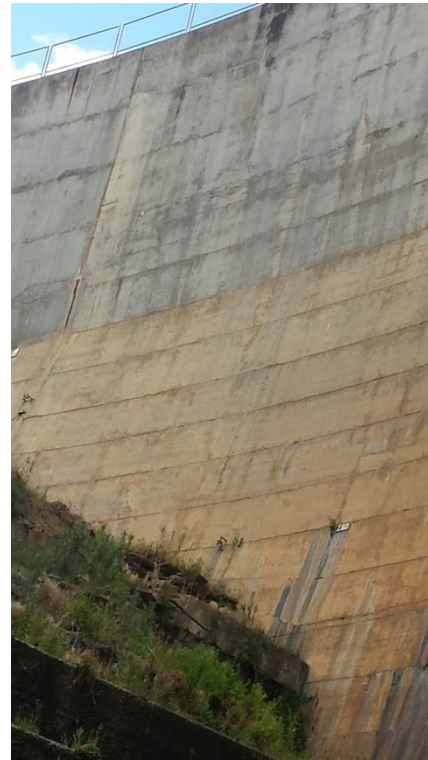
Poortjieskloof Dam: Close-up view of the far-right flank downstream face
